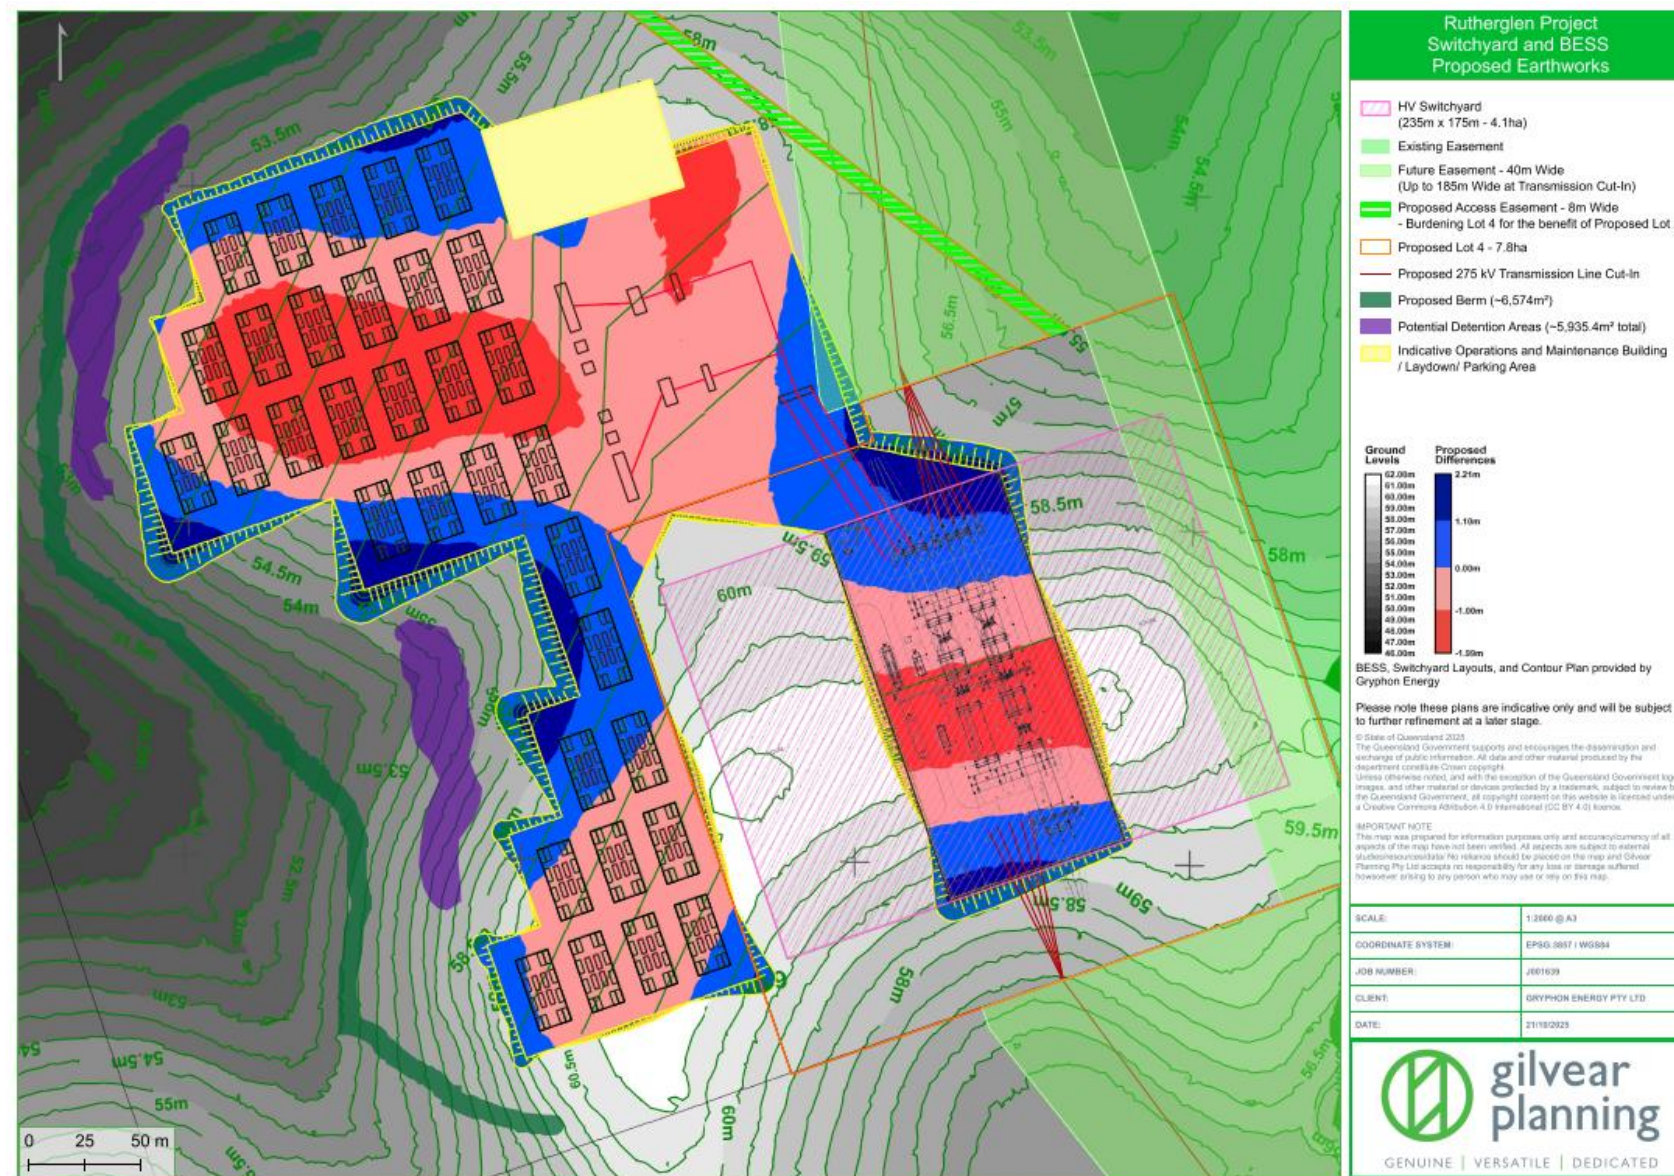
Proposed BESS and Switchyard Layout (Gilvear Planning, 2025)
